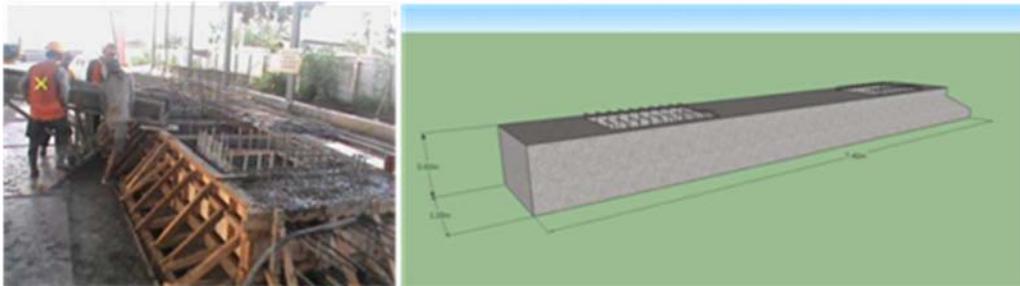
Production of Concrete Pile Cap (a) Foundry Pile Cap, (b) Precast Pile Cap
